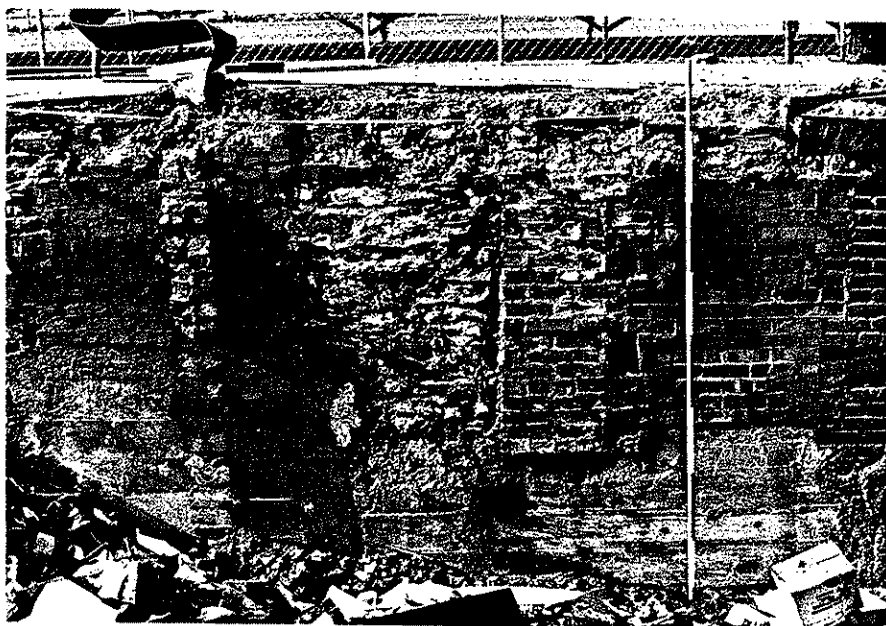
View looking west at west foundation of the Trenton House property, North Warren Street in background; scale in feet (Photographer: Lynn Rakos, November 1987).
